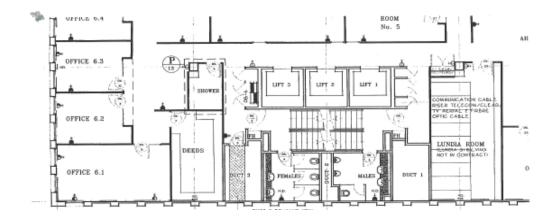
Lobby and stair plan on typical floor - Building M1
